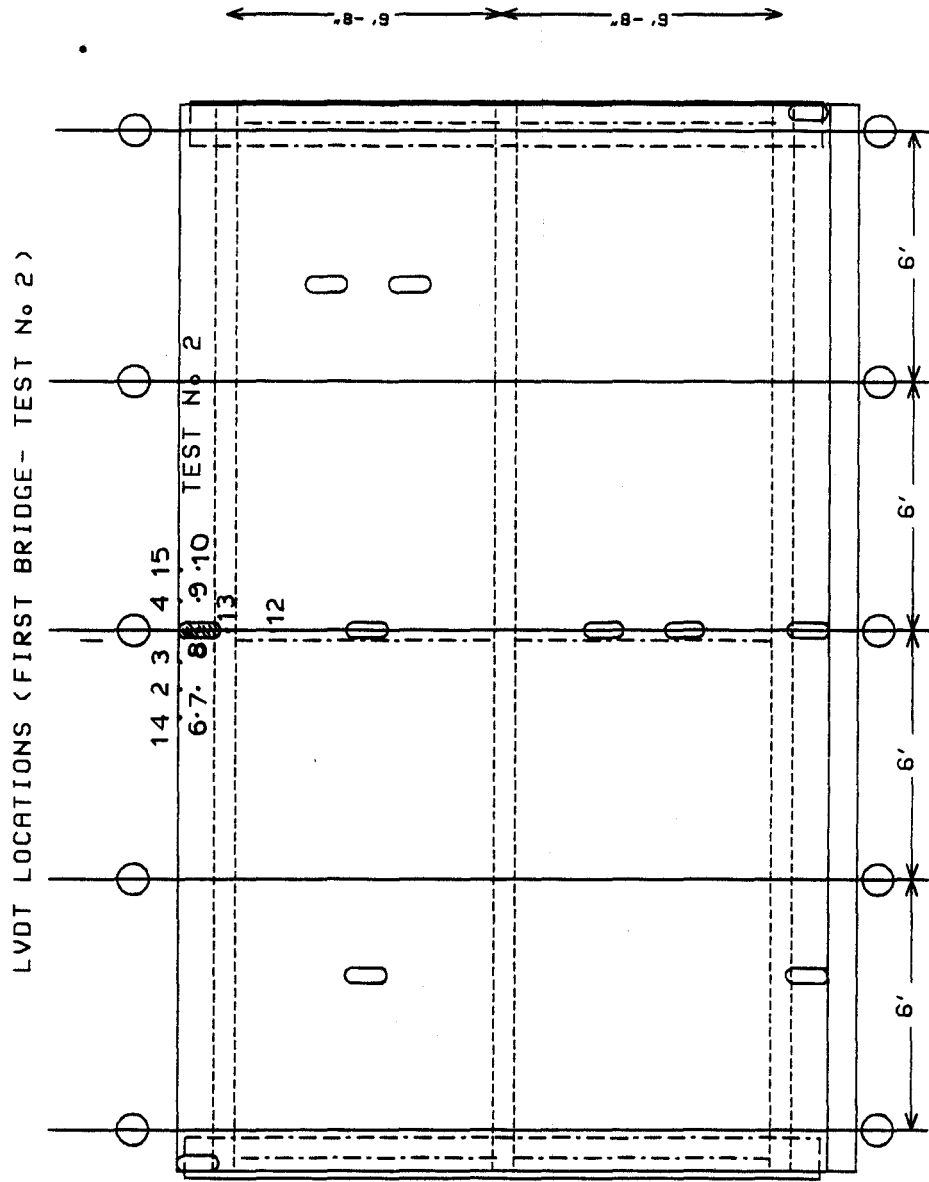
LVDT Locations (First Bridge - Test No. 2)
